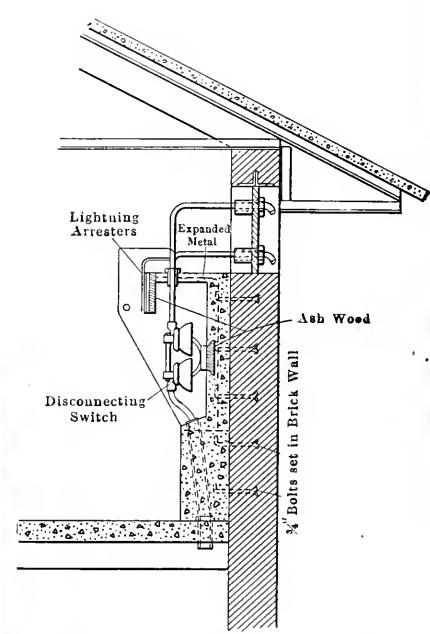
ELEVATION OF LIGHTNING-ARRESTER ARRANGEMENT
